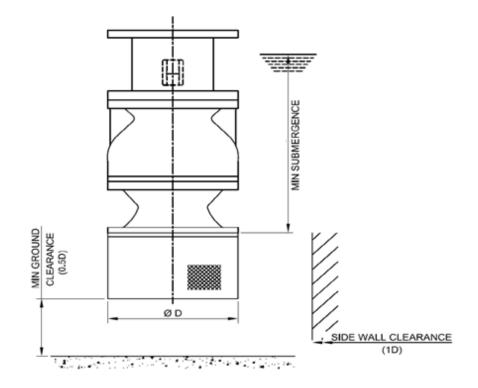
Intake bay layout (Page No. 26, Point No. 8.1)
